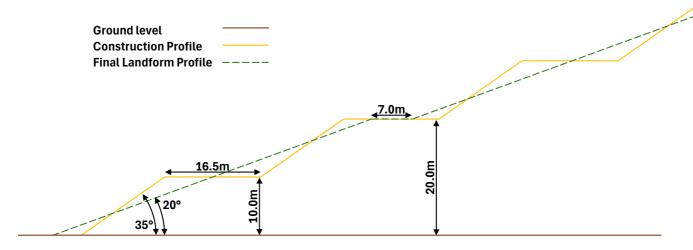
Waste Rock Dump Design Criteria (Construction and Final Landform)
